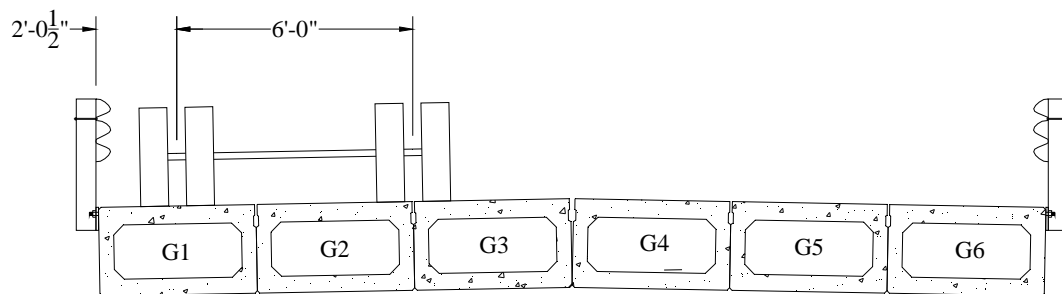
One of several transverse load positions of load truck to evaluate the service level bridge performance.
